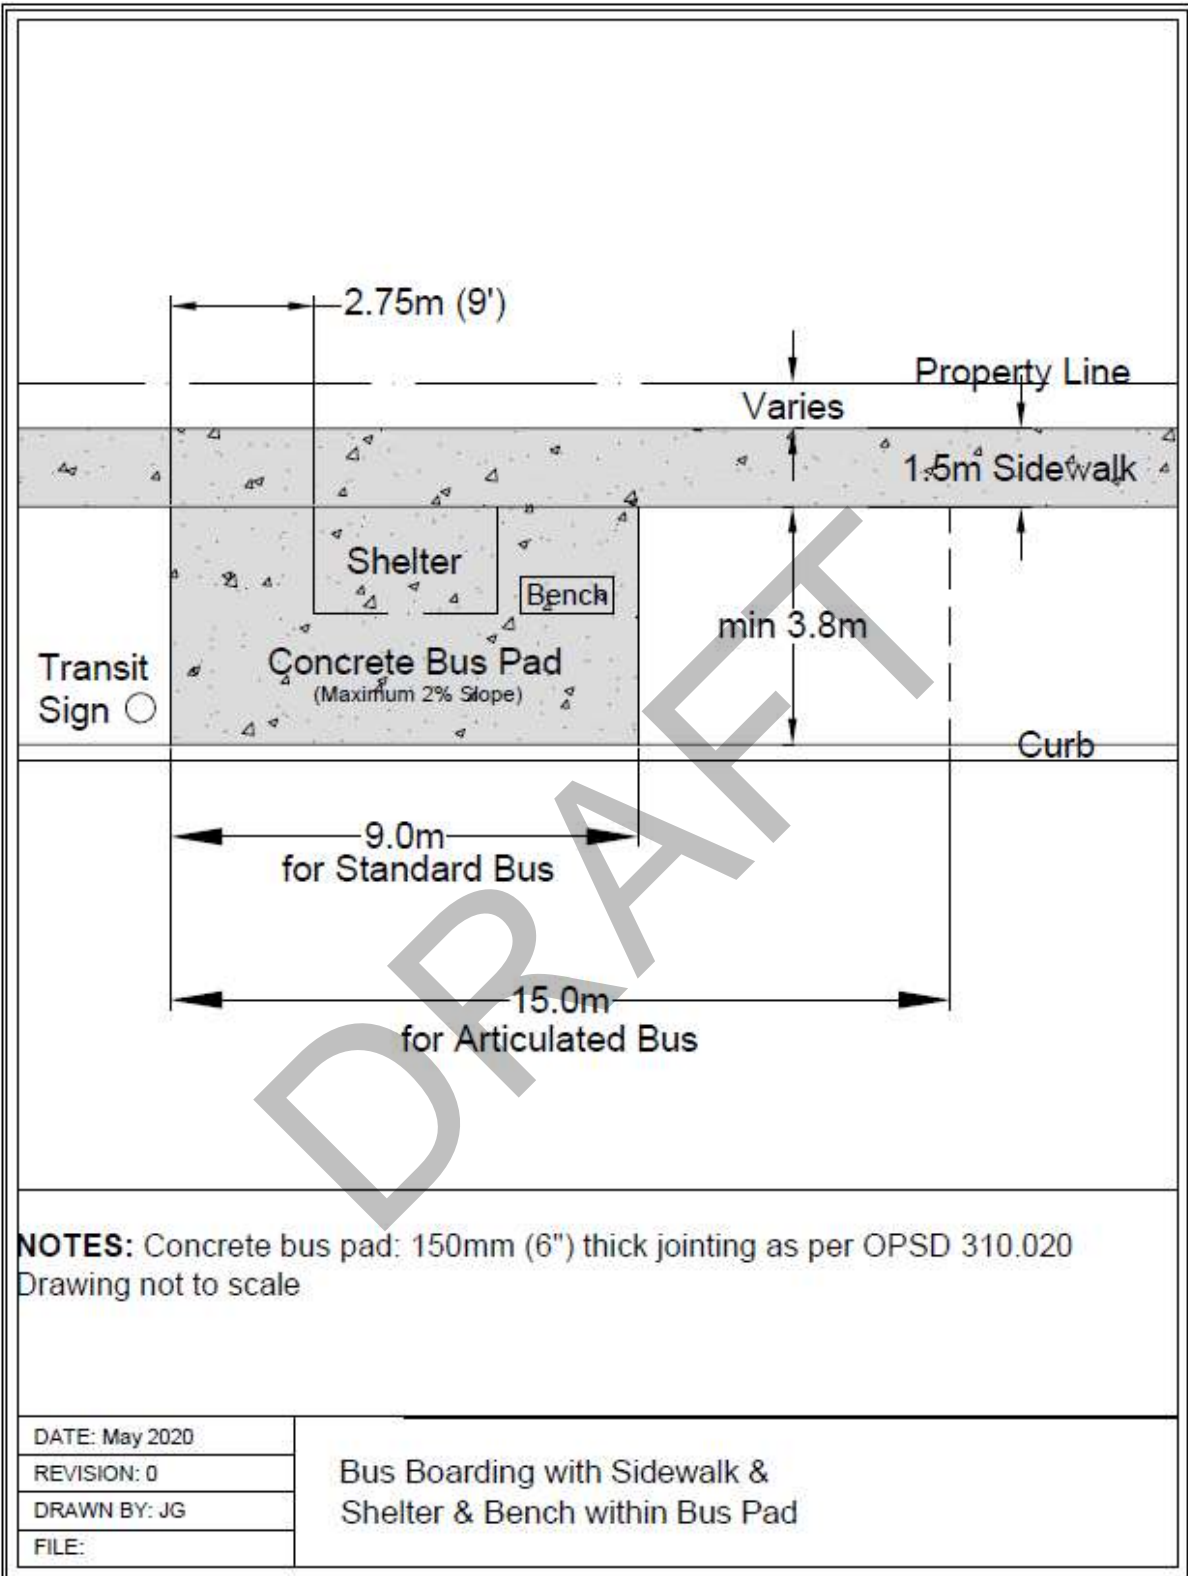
Diagram of bus boarding with sidewalk, shelter and bench within bus pad.
